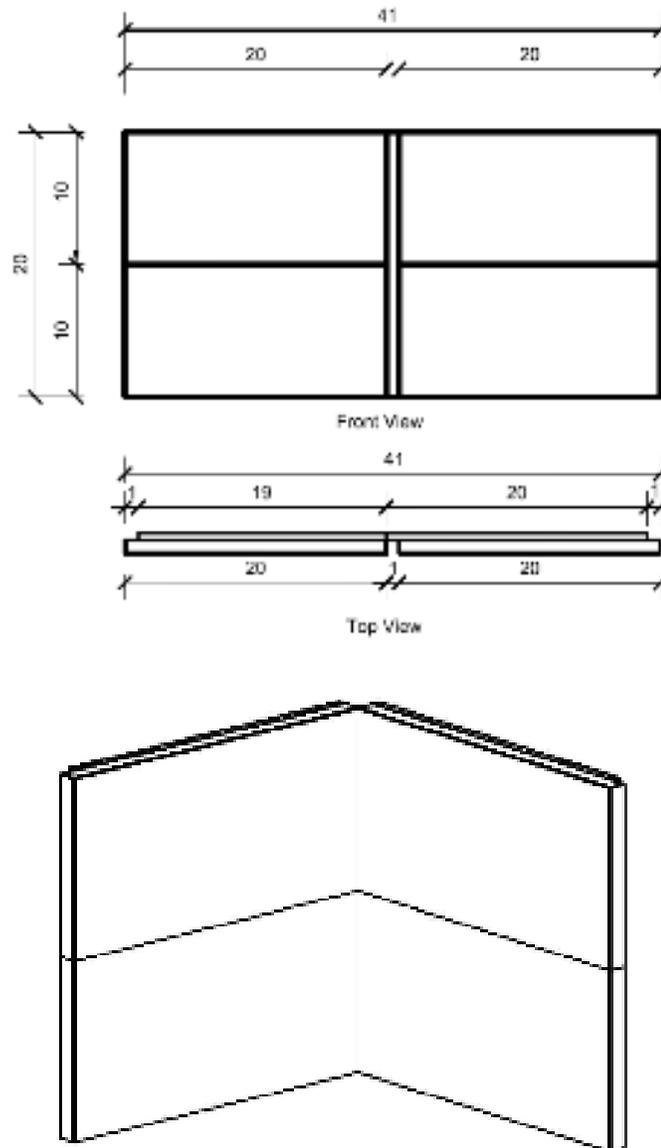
Drawings of the experiment the model (front view, top view, and perspective)
